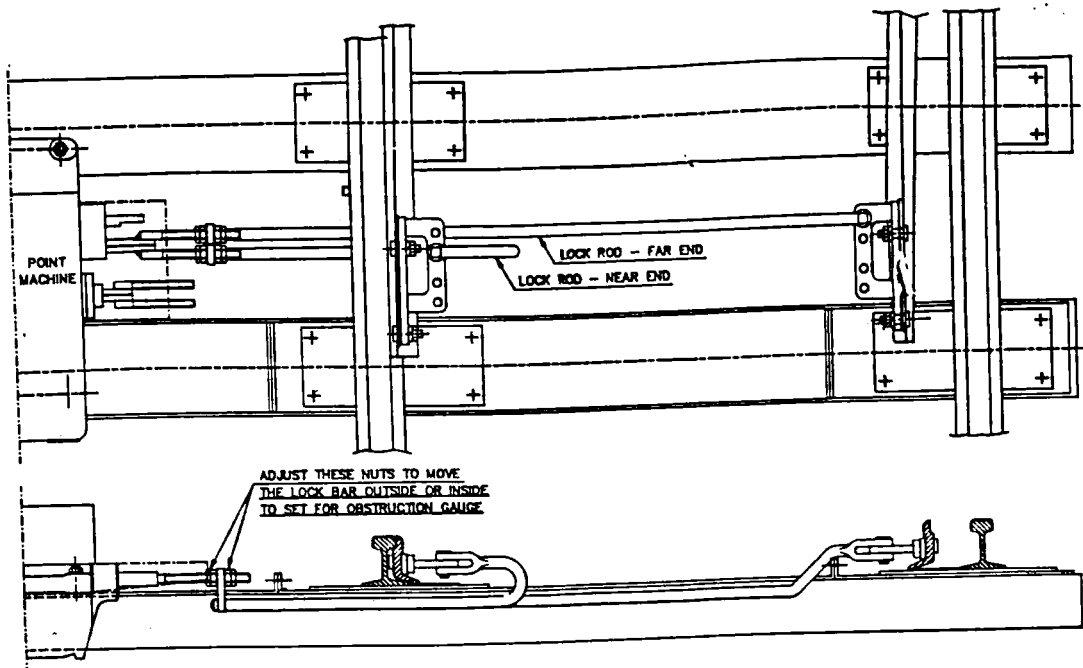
SECTION SHOWING LOCK ROD CONNECTIONS
